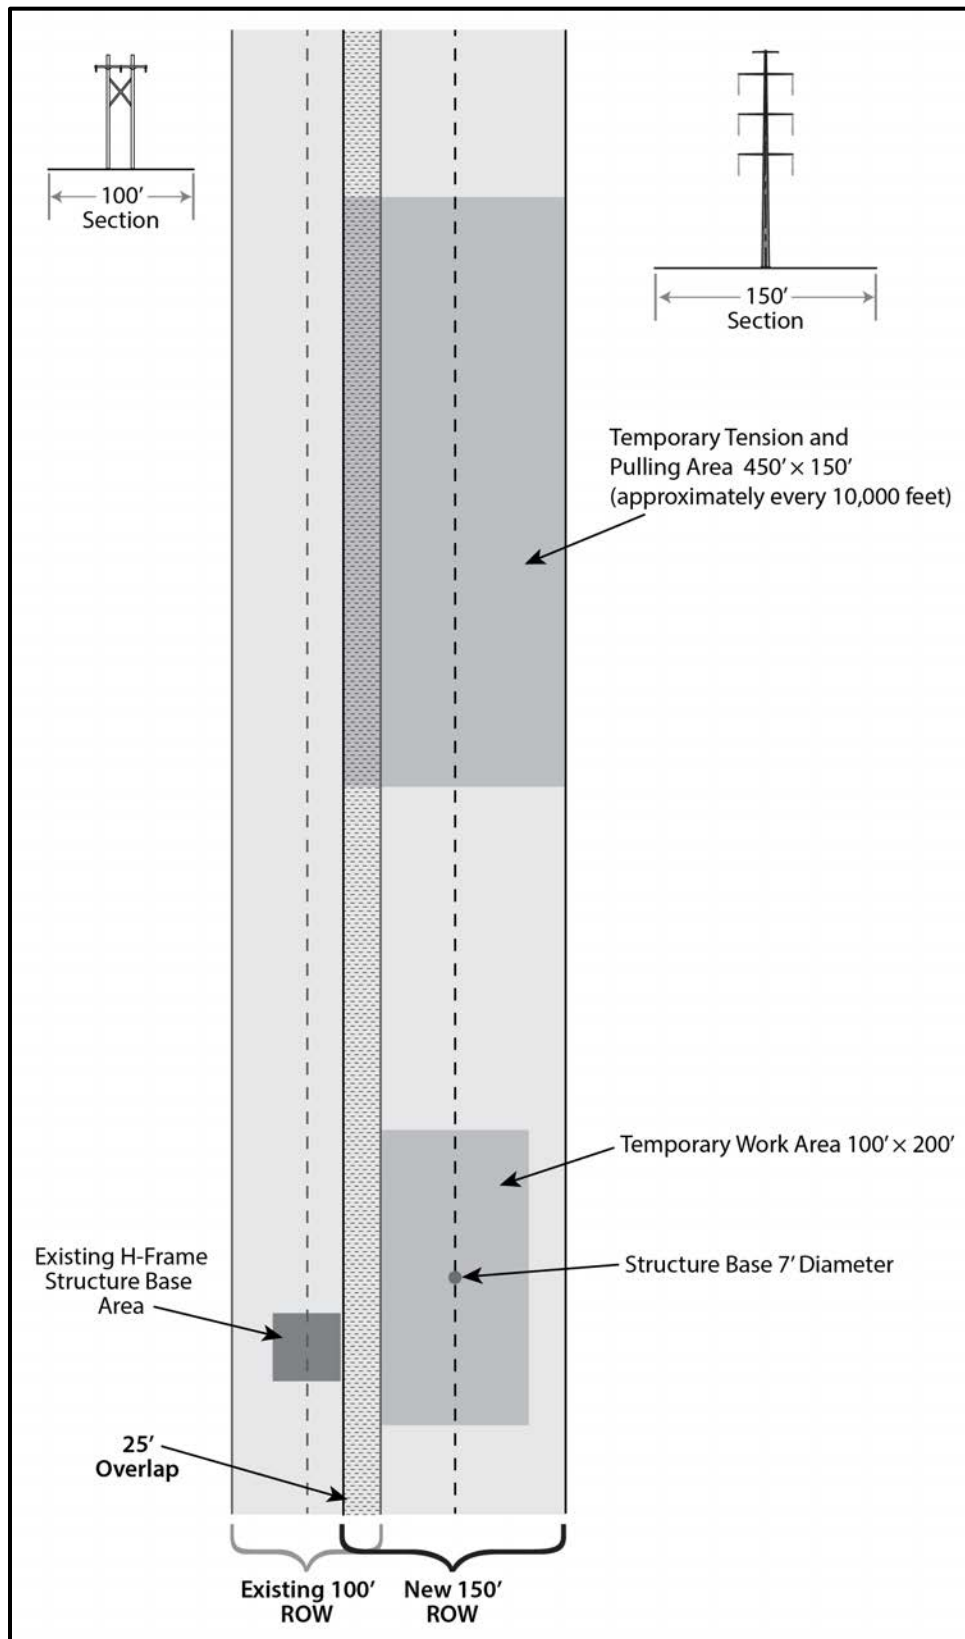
Typical ROW configuration (150-foot), Upgrade Section.
